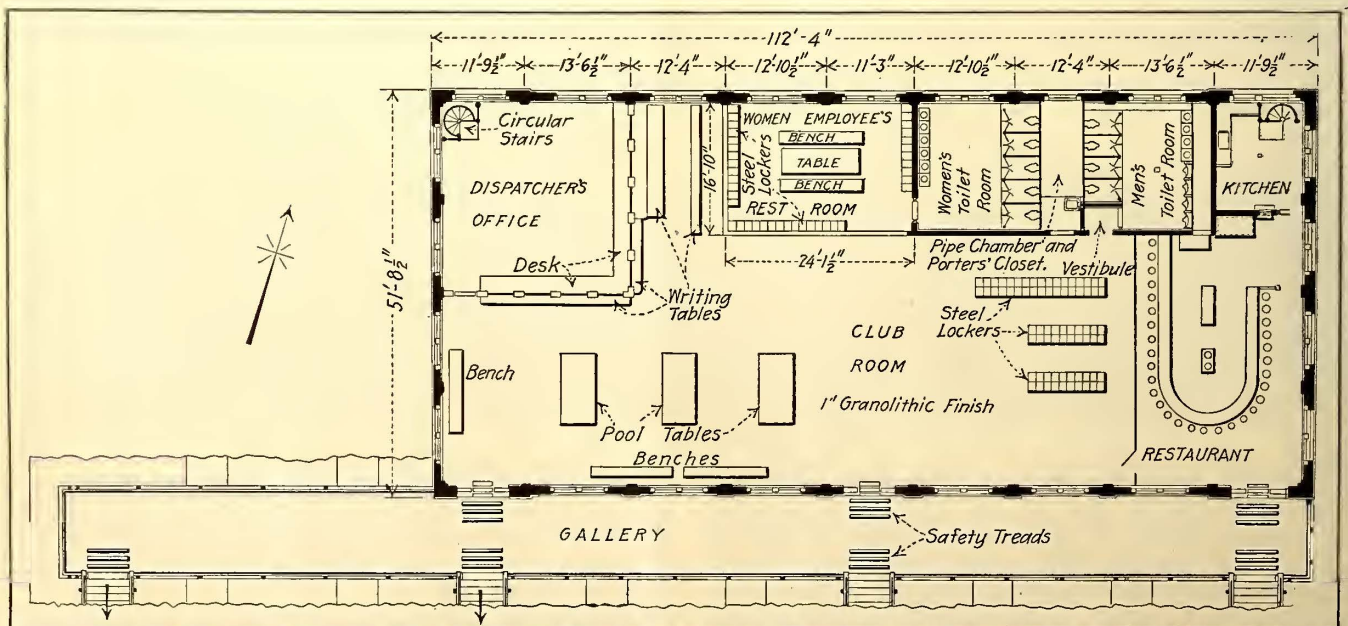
PLAN OF TRAINMEN'S BUILDING BUILT ABOVE STILLWELL AVENUE STATION PLATFORMS
